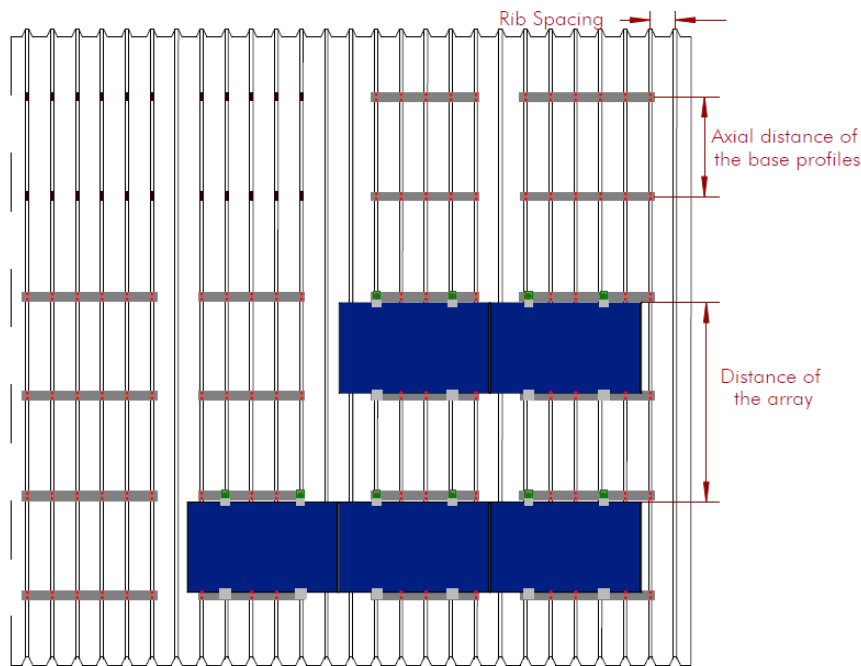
Schematic drawing for fastening the base profiles to the trapezoidal sheet – Standard fastening
